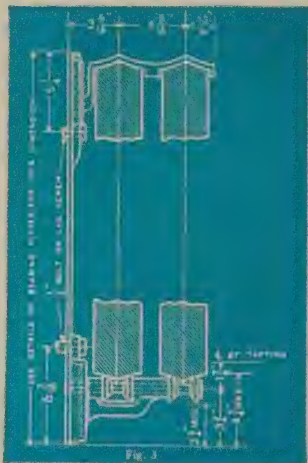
, 2 and 3 show construction details and measurements of Arco Adjustable Wall Brackets.
